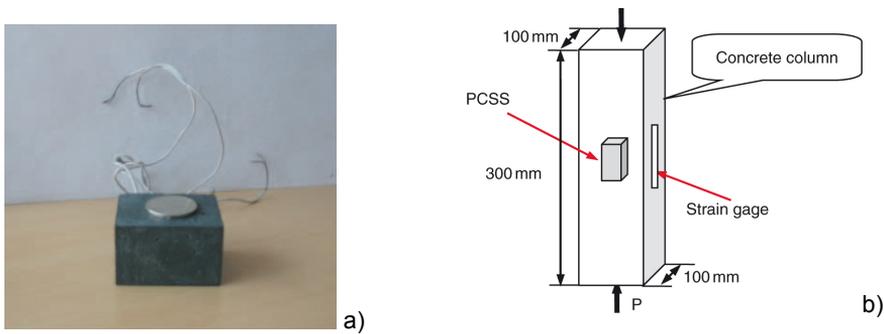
a) Piezoresistive cement-based strain sensors (PCSS); b) testing setup of PCSS in a reinforced concrete column subjected to axial load (Ou & Han 2998)
